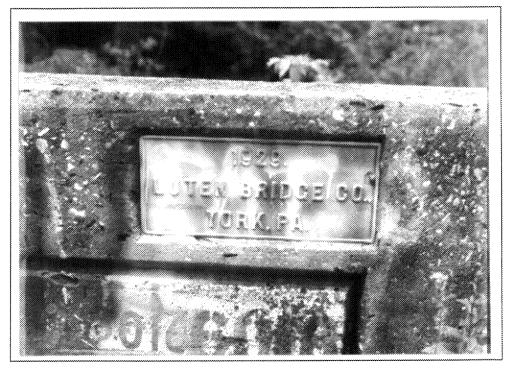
Bridge on Rt. 608 34-805, detail of plaque.
